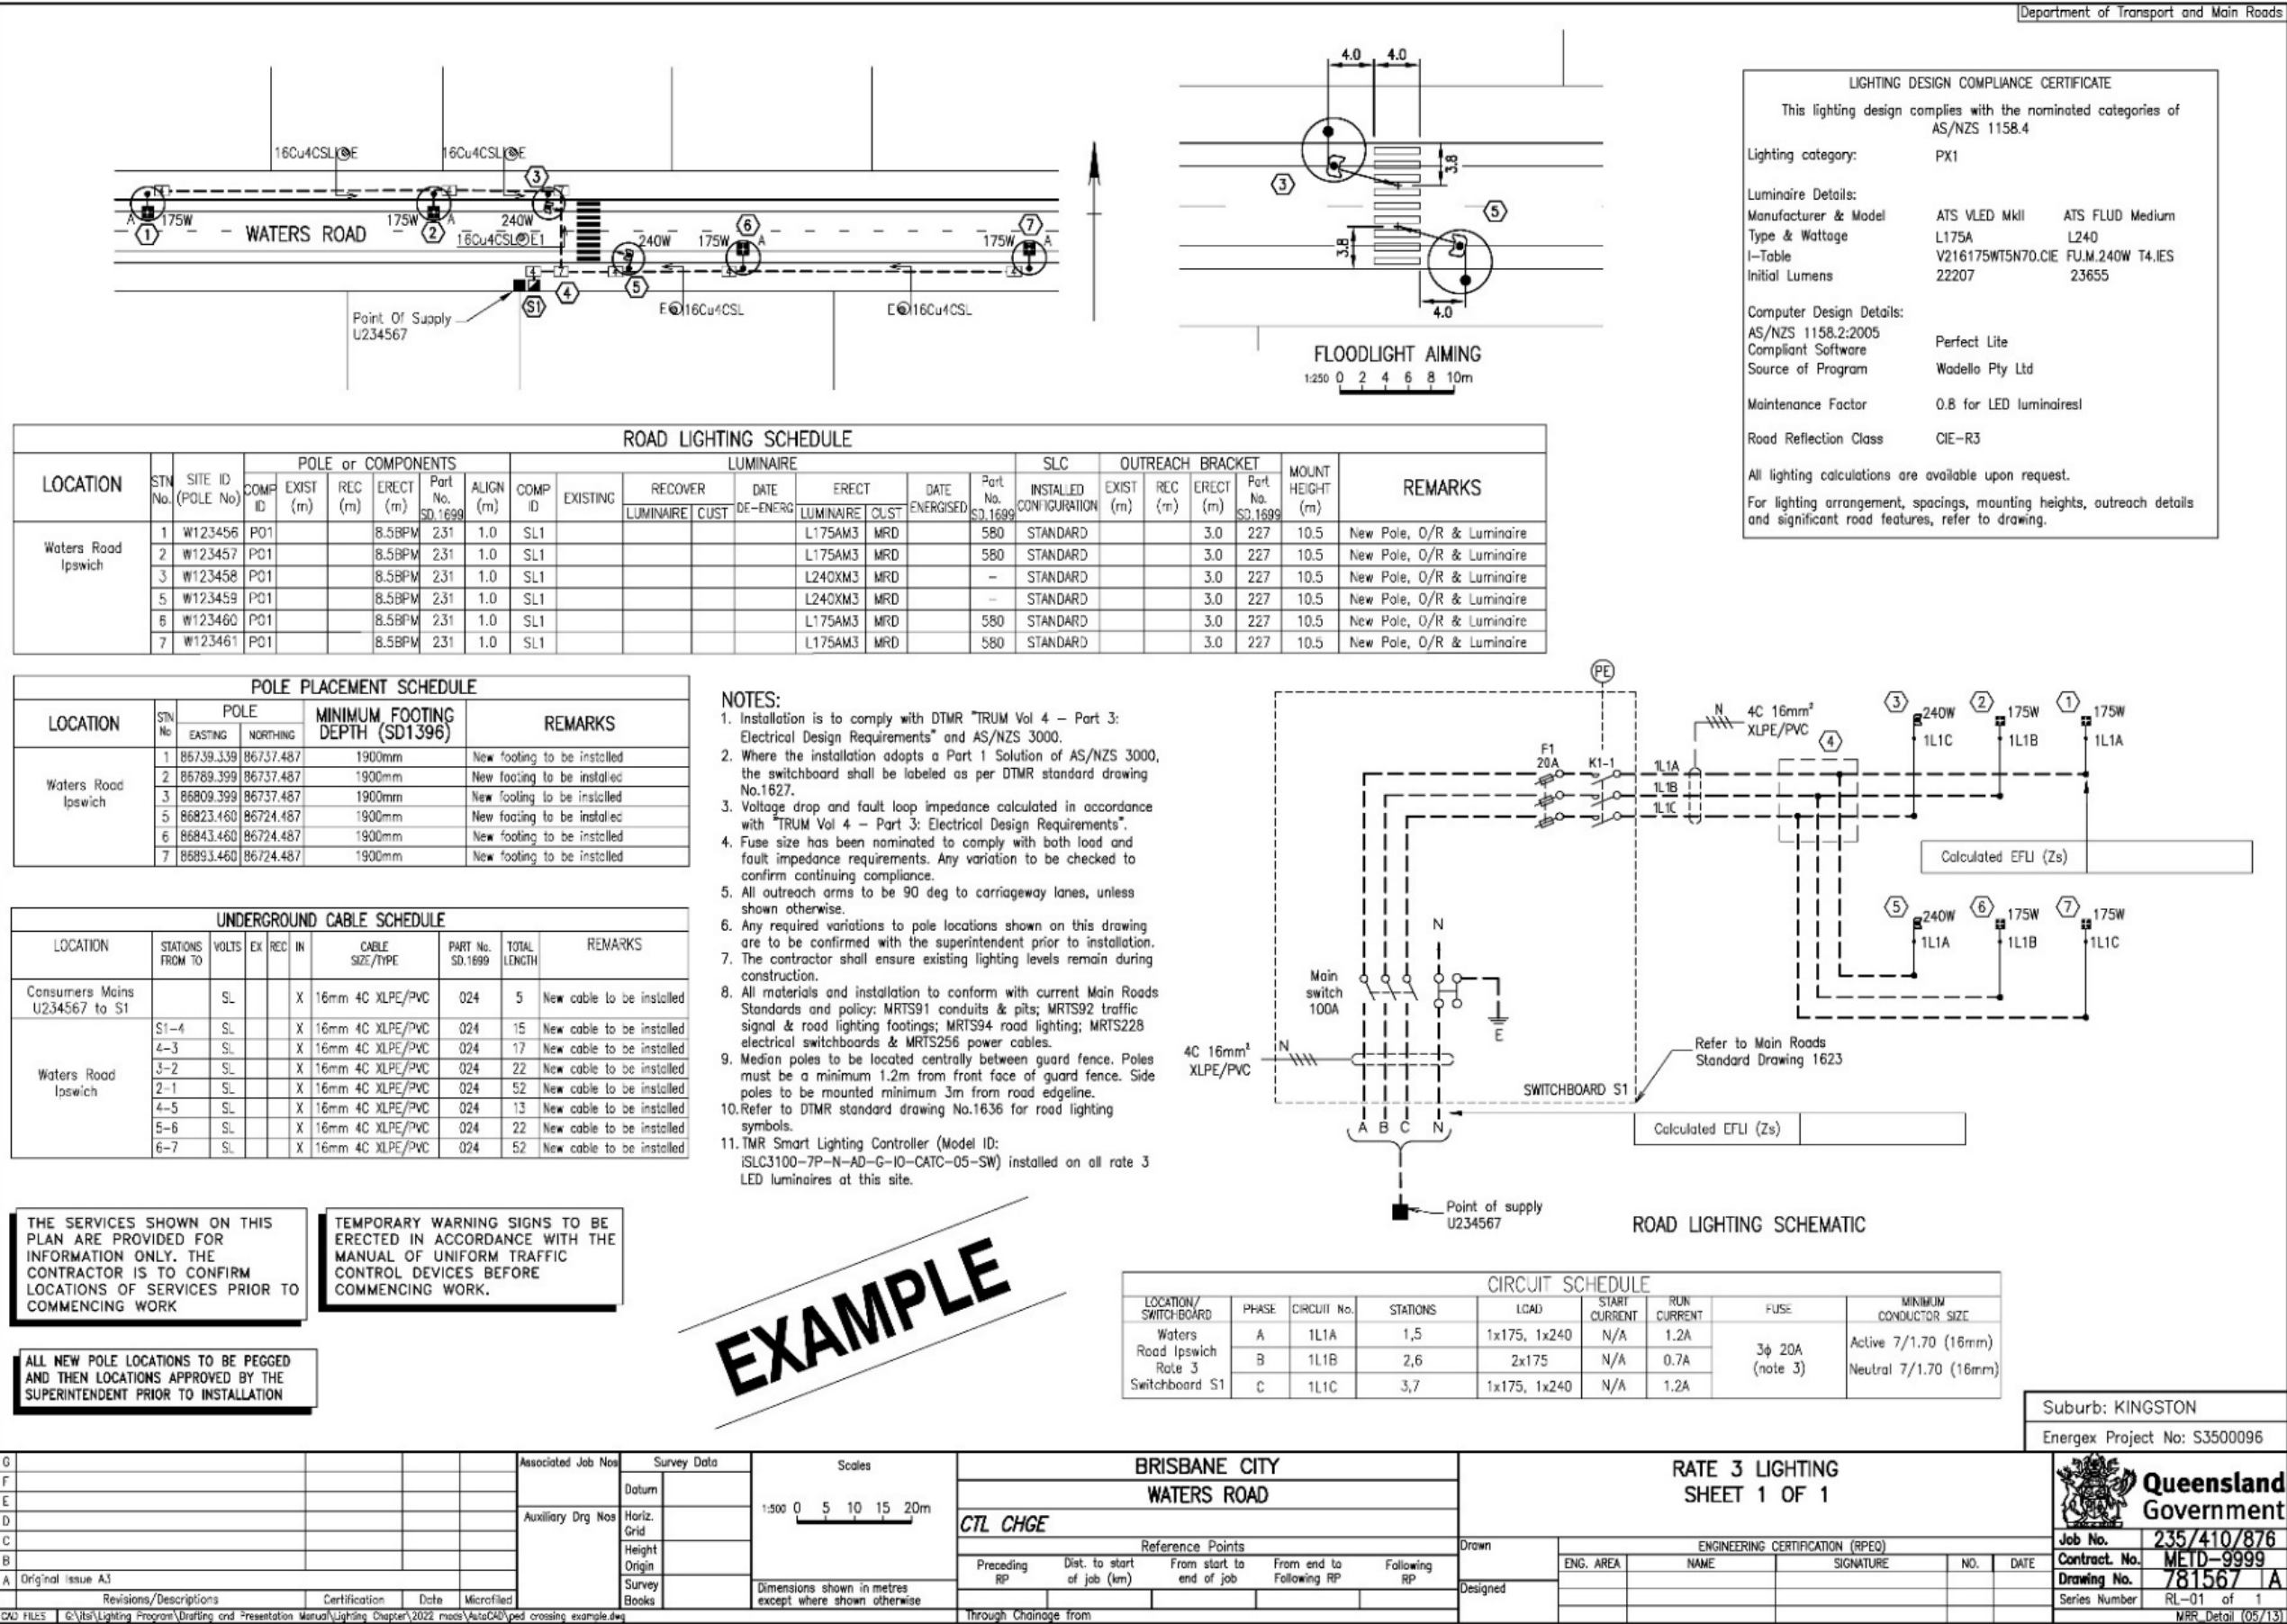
(h) – Road lighting layout – pedestrian crossing – registered example
